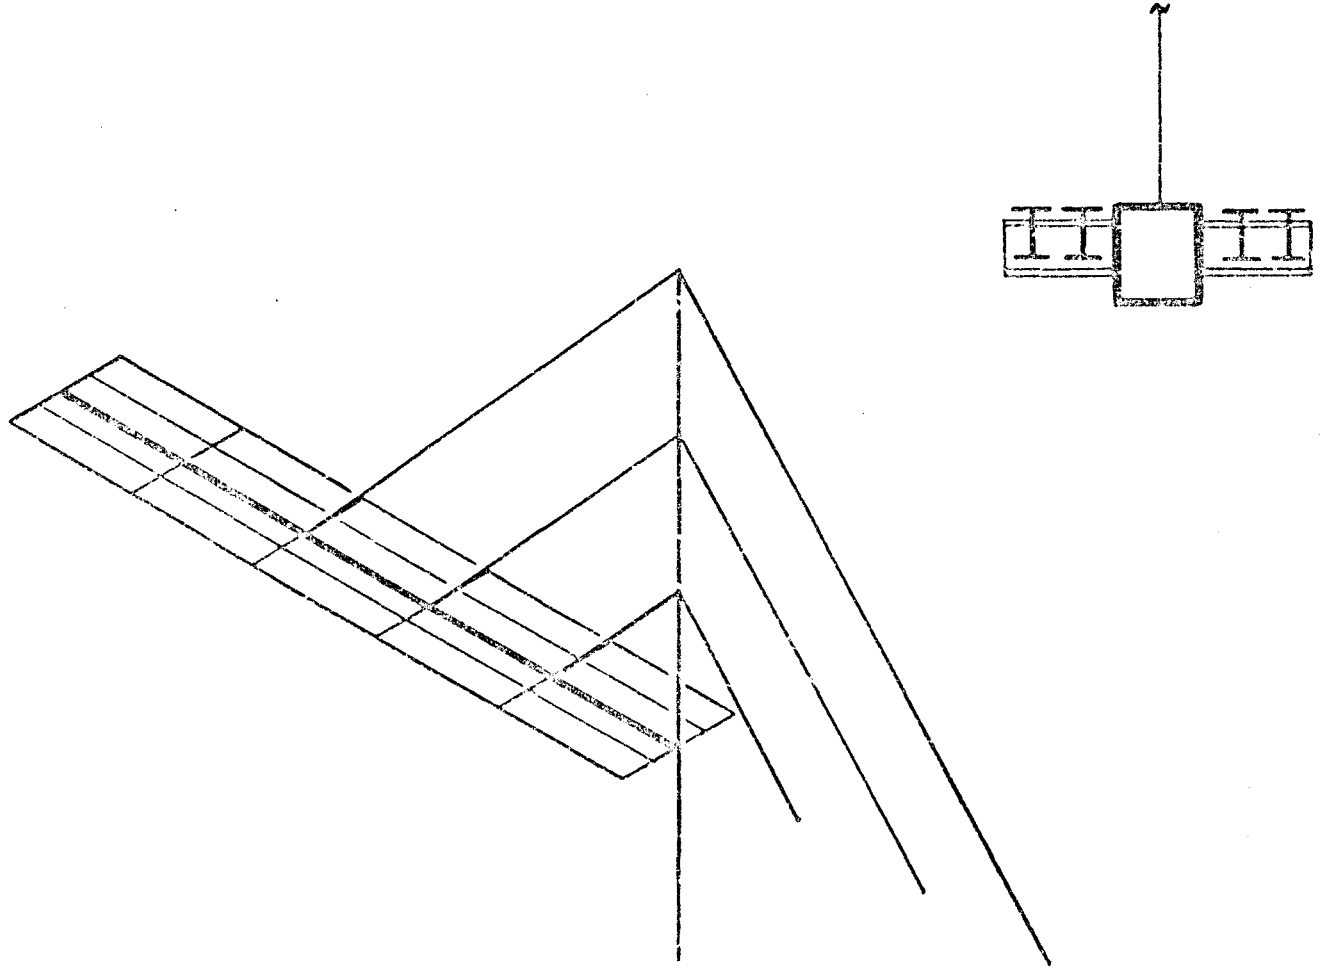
ISOMETRIC SCHEMATIC DRAWING OF STAYED GIRDER BRIDGE CONCEPT IN NEW BRIDGE APPLICATION
